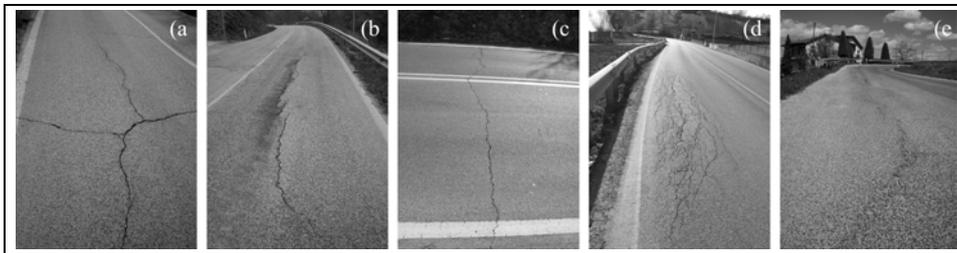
Structural defects examined in this study: a) transversal and longitudinal cracks, b) longitudinal cracks only, c) transversal cracks only, d) ramified cracks, e) failures.
